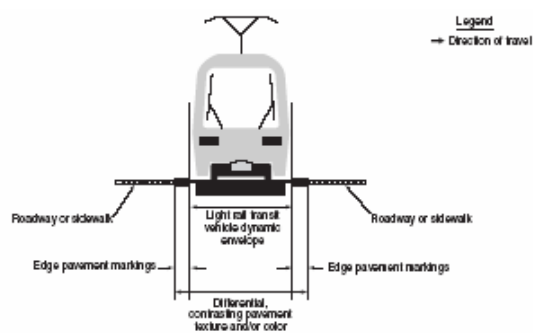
C-8. Typical Light Rail Transit Vehicle Dynamic Envelope Pavement Markings
